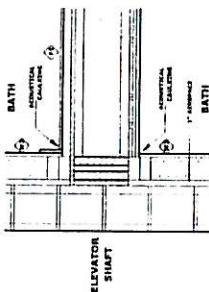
DETAIL - ELEVATOR SHAFT AT MAIN FLOOR SLAB
